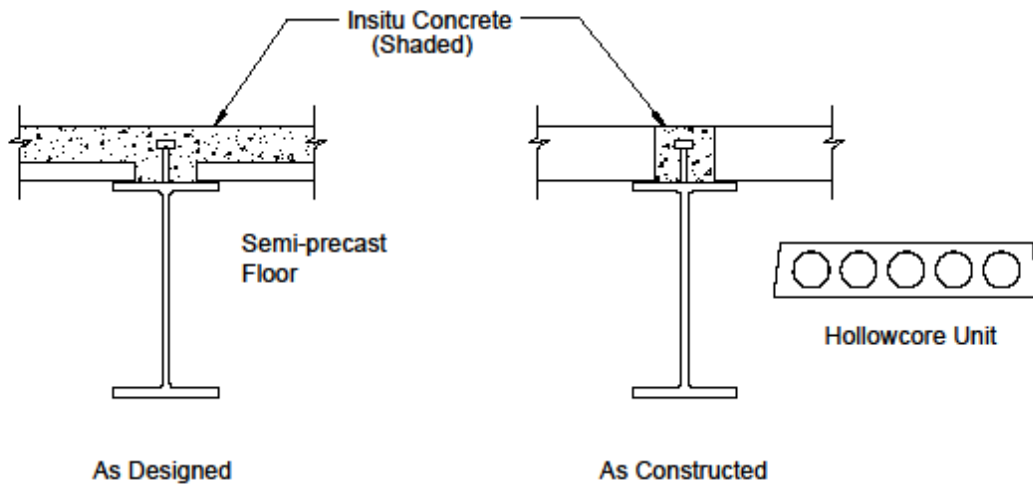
a. The structural engineer's design intent and the "as-constructed" beam detail.
